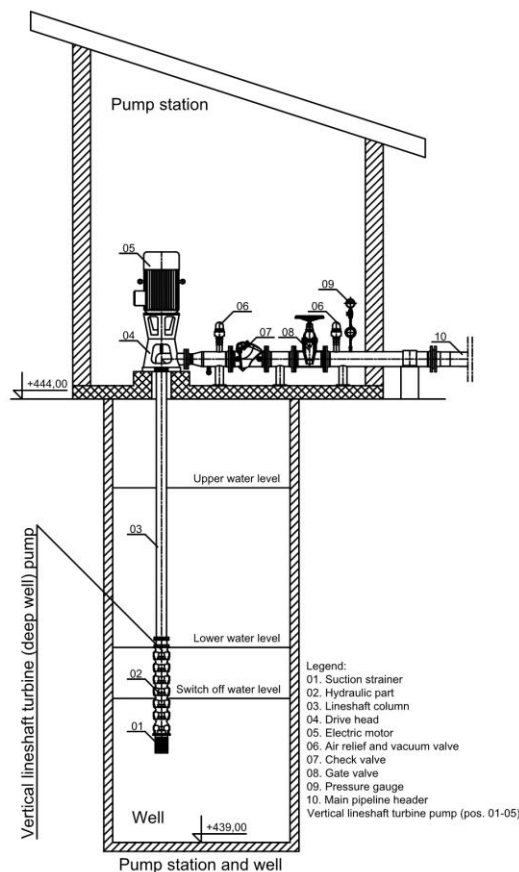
Pump station and well of the sprinkling installation for sprinkling the Leposavić tailing dump
